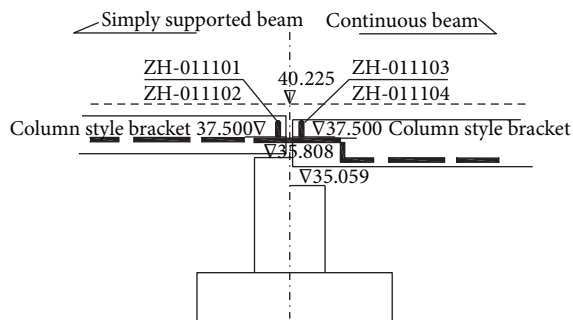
Monitoring point layout for an additional section of a continuous beam side pier.
